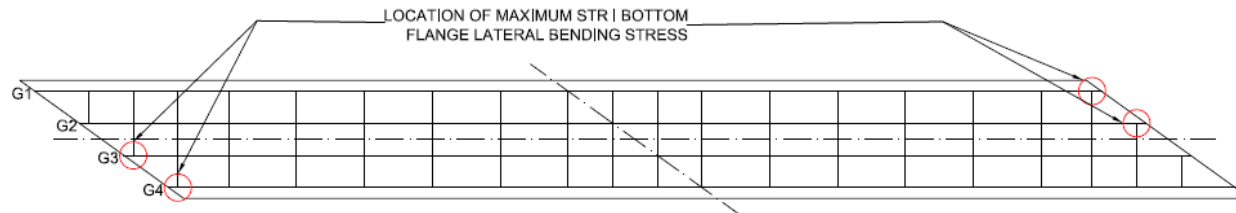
Maximum STR I bottom flange f_l in girders of Bridge 25.
